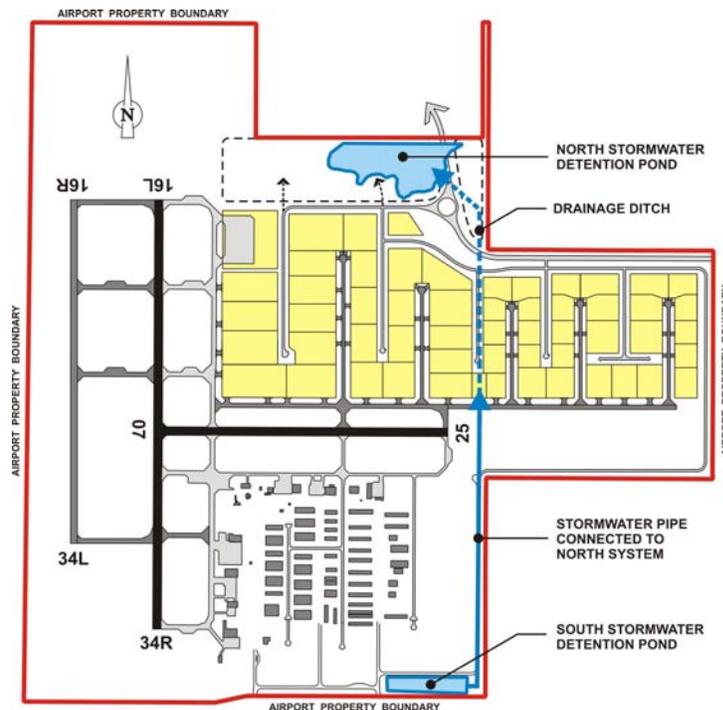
PROPOSED STORMWATER SYSTEM
